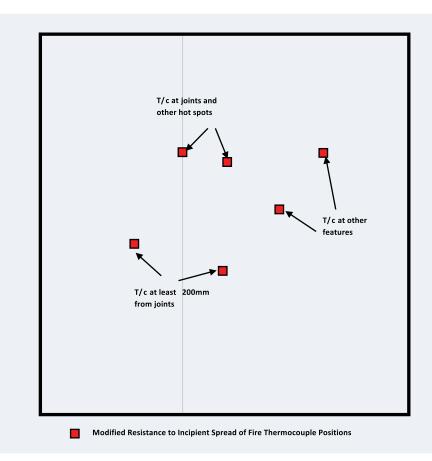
Elevation of a wall showing modified RISF thermocouple positions.
